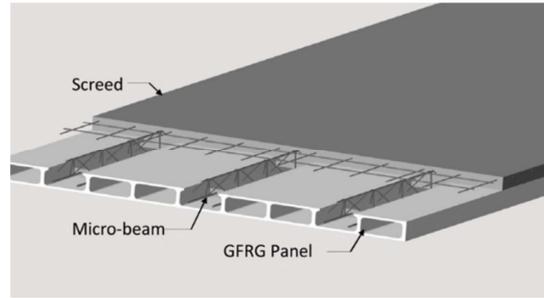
GFRG floor slab with micro beam and screed Installation [8].
